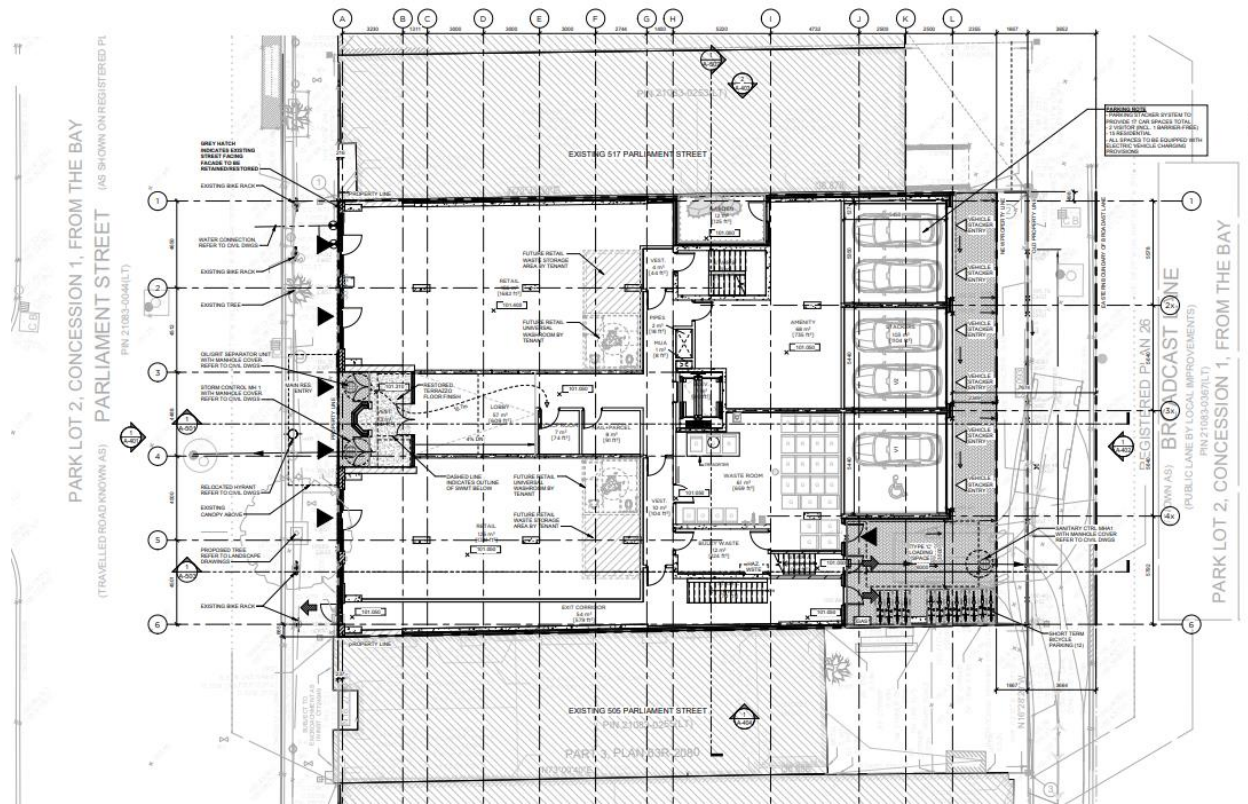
Proposed ground floor for 509 Parliament Street (RAW Architects Inc., 2025).
